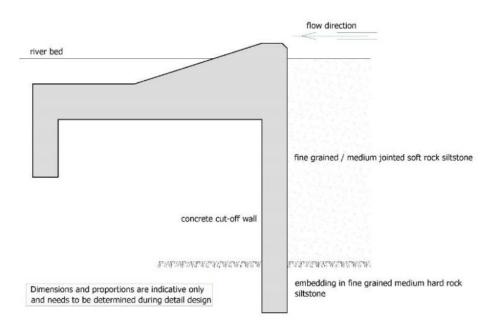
Cross Section through the proposed low crest concrete weir (Posch and Partners, July 2018)
